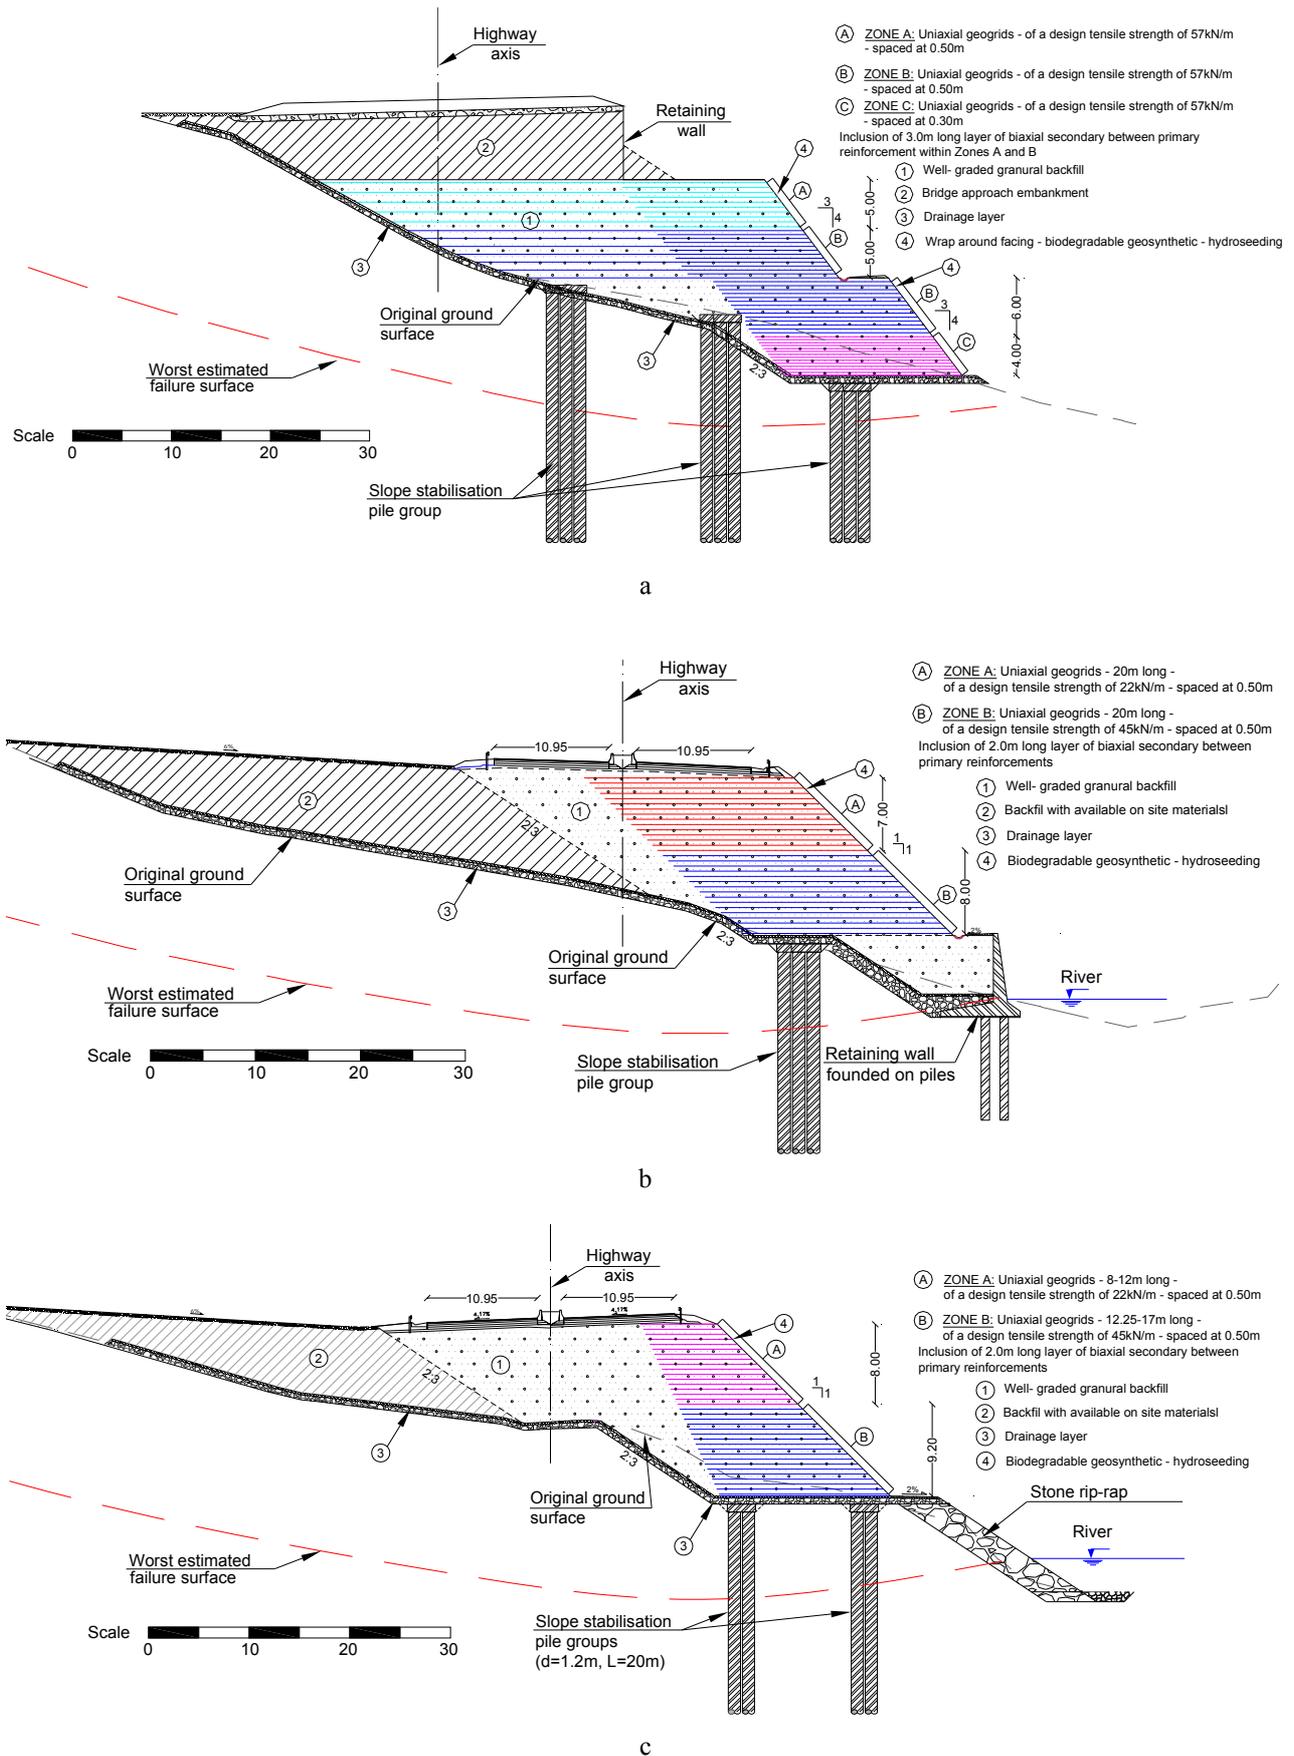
(a, b and c). Typical cross sections of reinforced highway embankments along the Egnatia highway designed also as slope stabilization measures by providing a downslope toe weighting.
